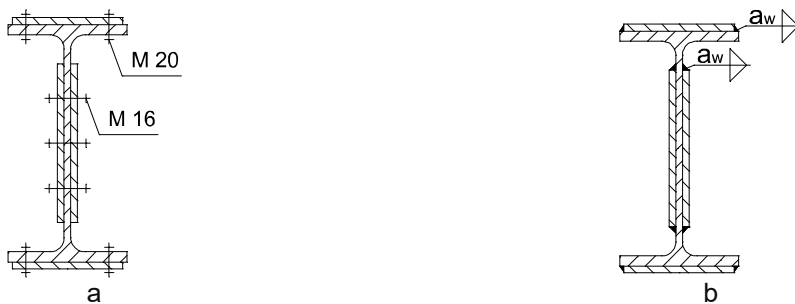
Example for conventionally reinforcements of steel girders with screwed and b) welded steel plates.
